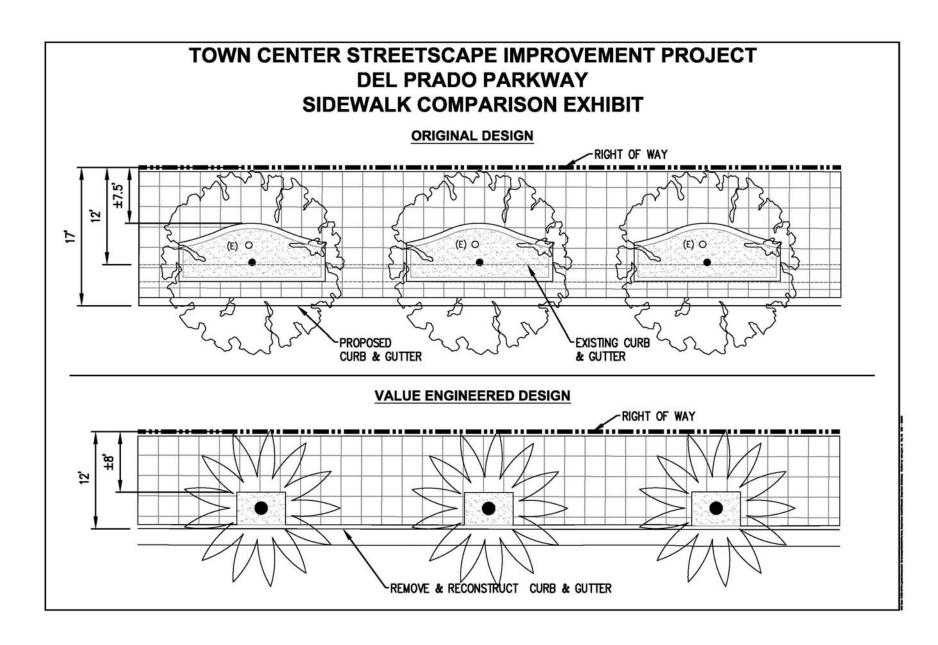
Del Prado Avenue Parkway Treatment
